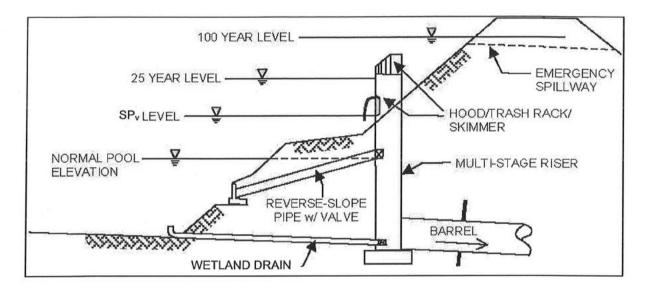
Typical Wetland Facility Outlet Structure
